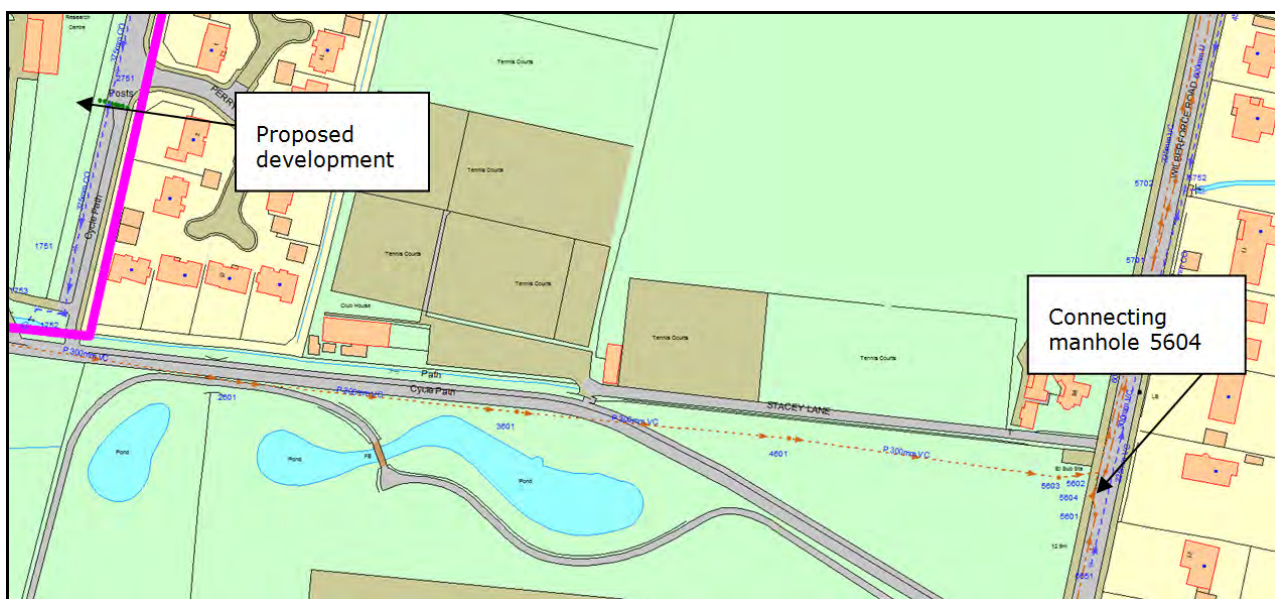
Showing the location of the proposed connection point in Wilberforce Road (40l/s)
